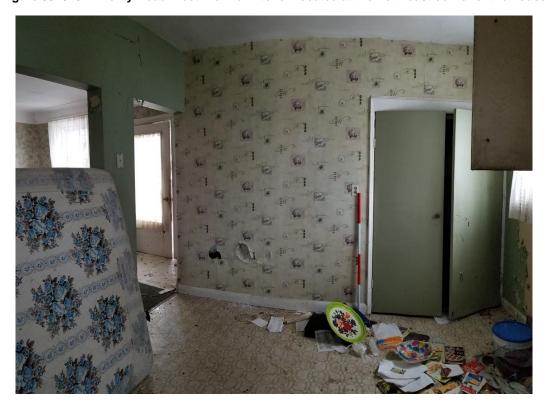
9751 Twenty Road West: Former kitchen facing west
